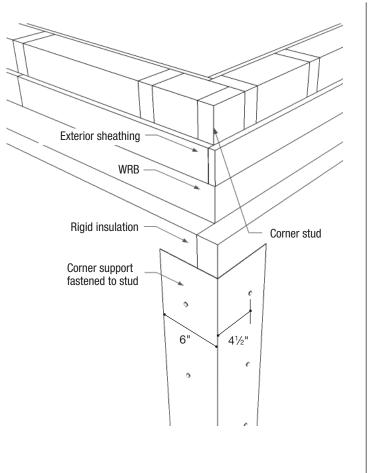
CORNER SUPPORT FASTENED THROUGH INSULATION
